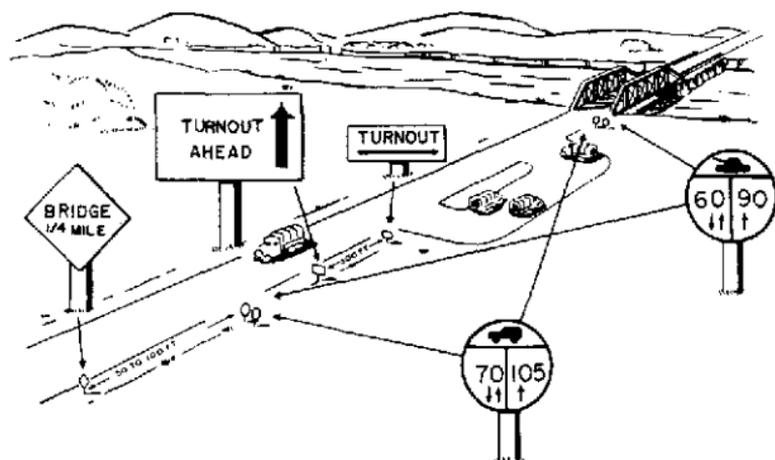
Typical two-lane bridge applications of bridge class and information signs and road guide signs.
